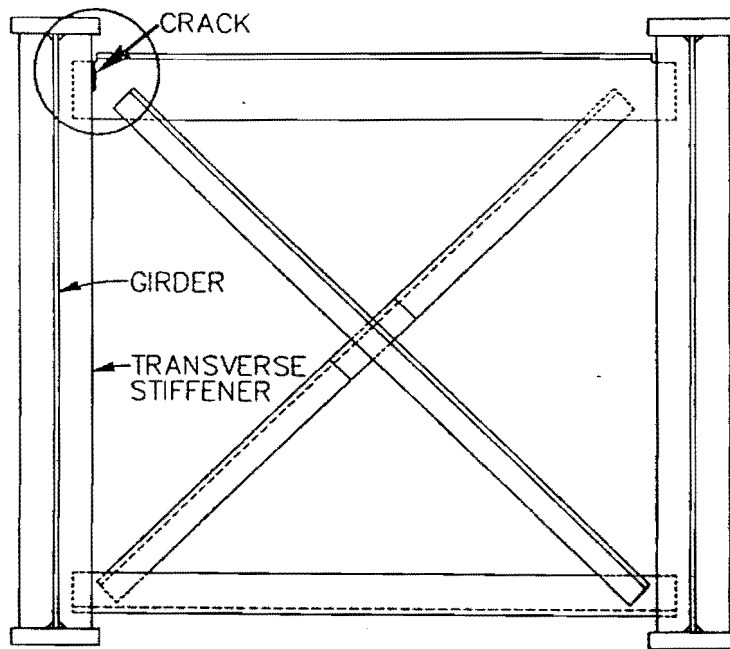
Typical location of Type B3 fatigue cracking.
